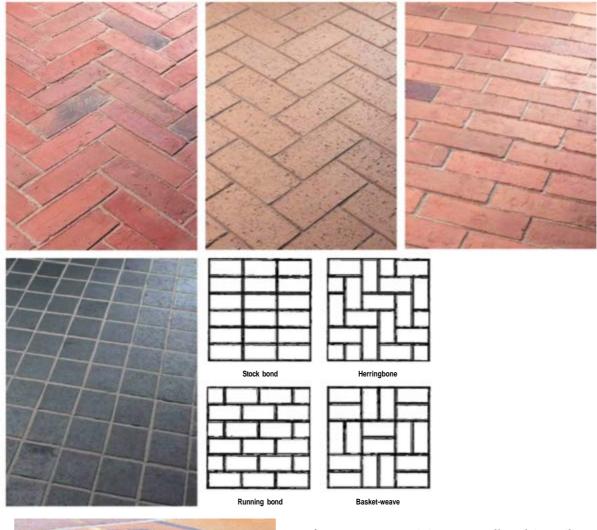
Continued. Typical range of clay pavers and hard landscape at Birmingham. Photographs: Courtesy of Baggeridge Brick Plc
